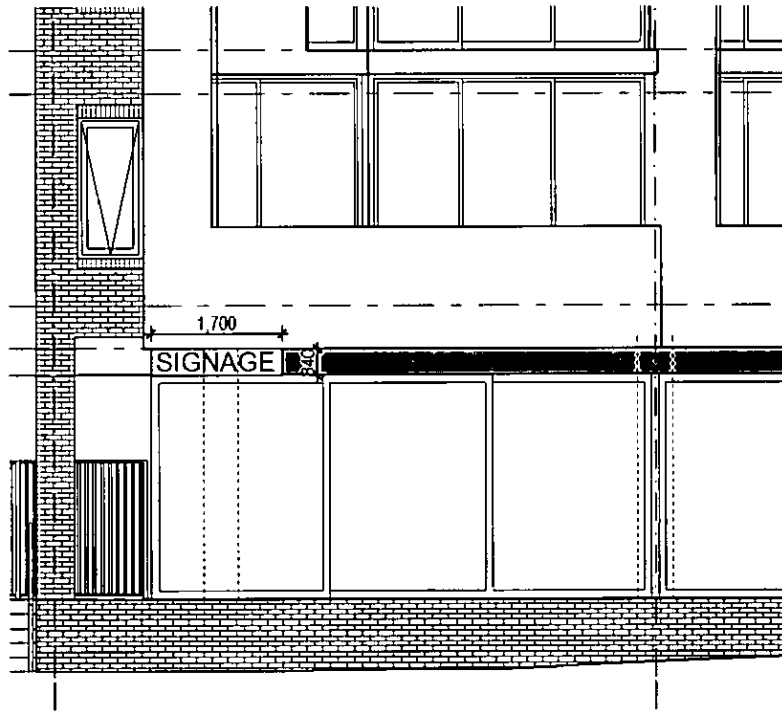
Retail (Lot 69) Elevation, Location and Size Plan
